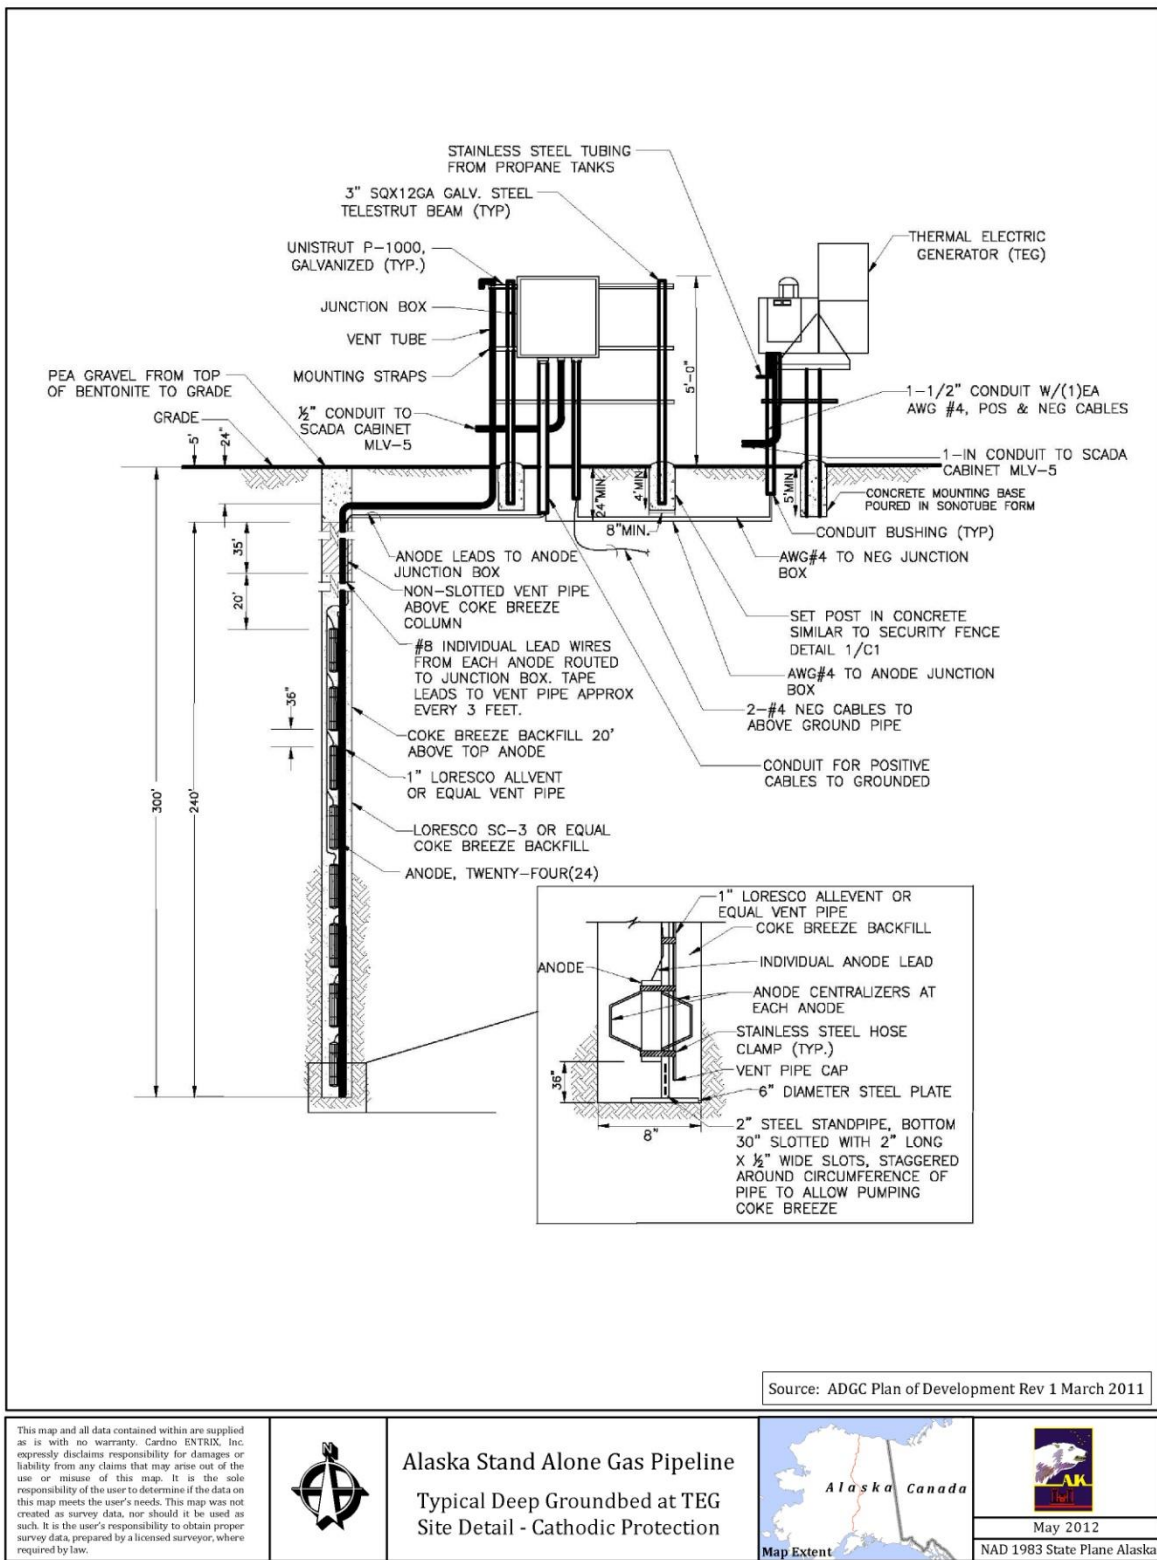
Typical Deep Groundbed at TEG Site Detail
